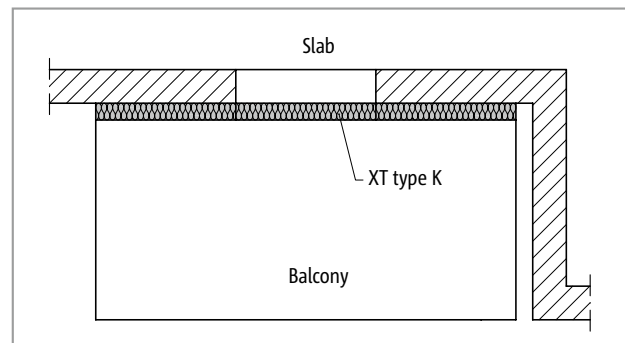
Schöck Isokorb® XT type K: Balcony with facade offset
